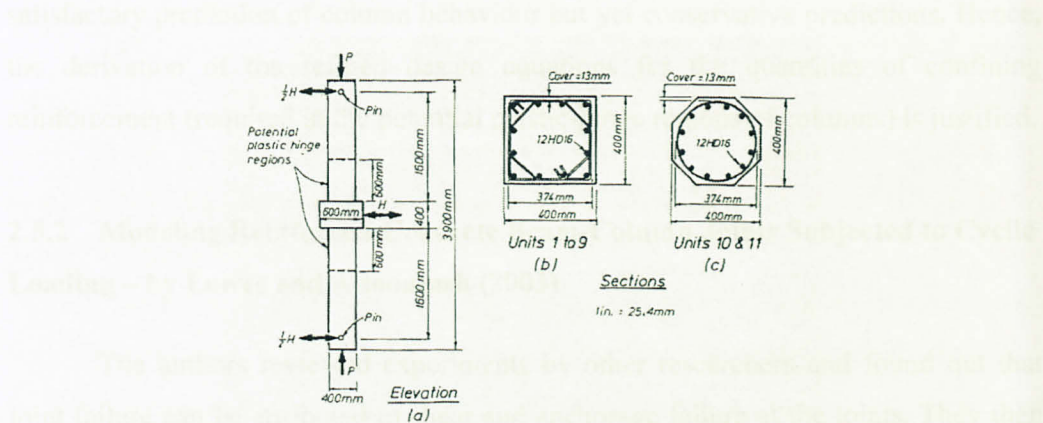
Dimensions of Column Units and Loading Arrangements (Source: Watson and Park, 1994)
